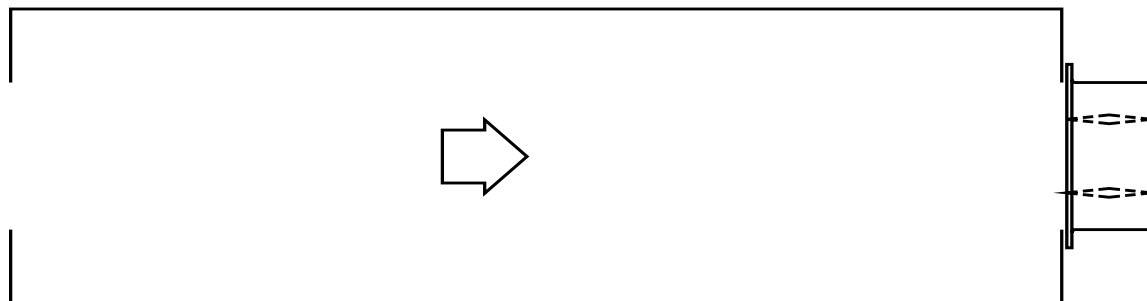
Illustrates a fully ducted damper. This configuration has the lowest pressure drop of the three test configurations because entrance and exit losses are minimized by straight duct runs upstream and downstream of the damper.
